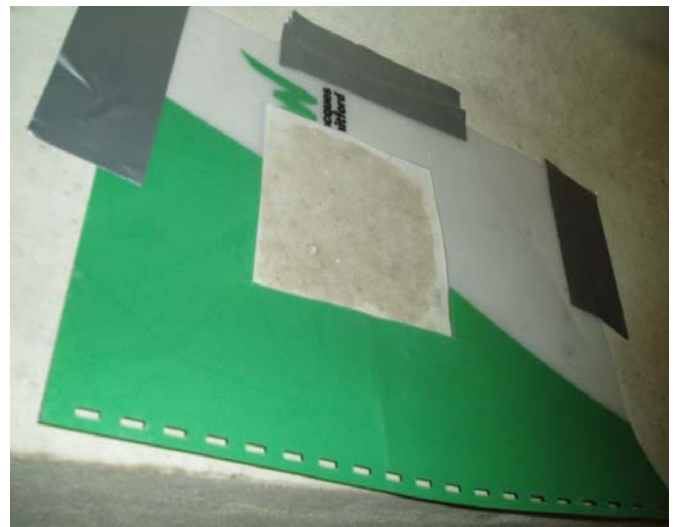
Location of BS-16 (Room 101 – Center Ceiling)
